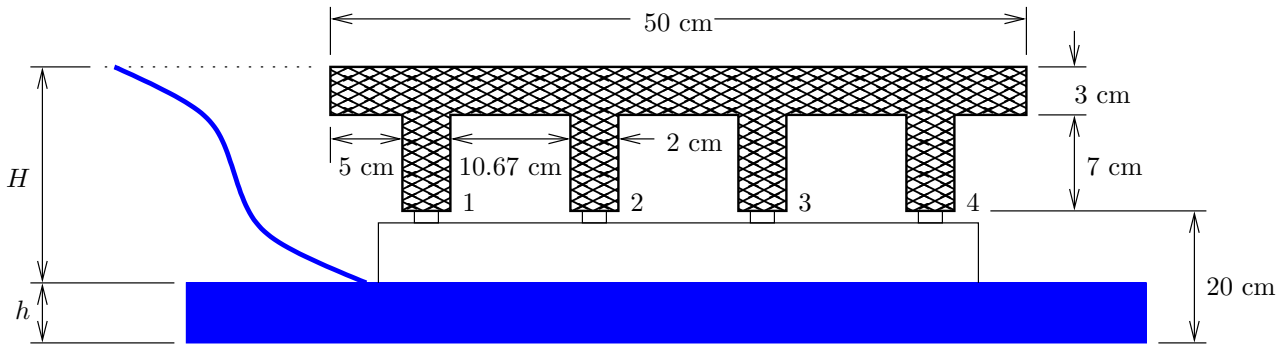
Model dimensions for deck-girder bridge in PWRI wave flume experiments.
